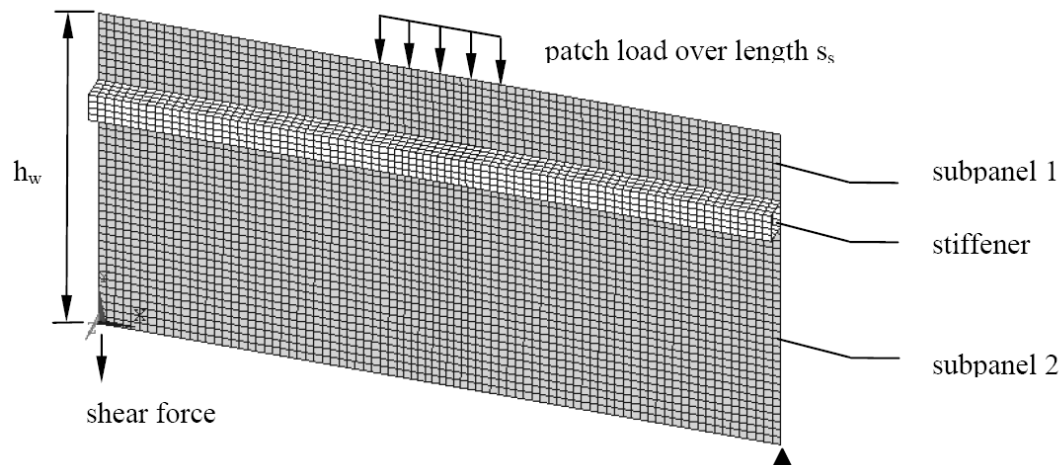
Example layout of a girder with a rigid longitudinal stiffener
